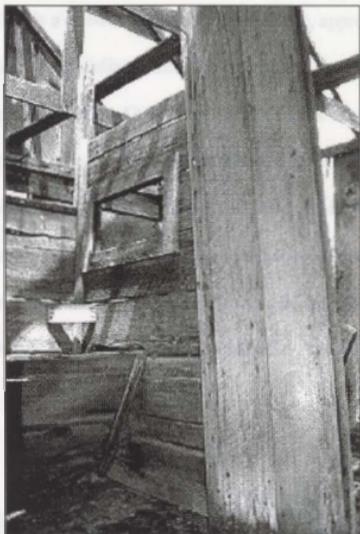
Horse Barn, Detail Showing the Divider Wall Between Stalls.
